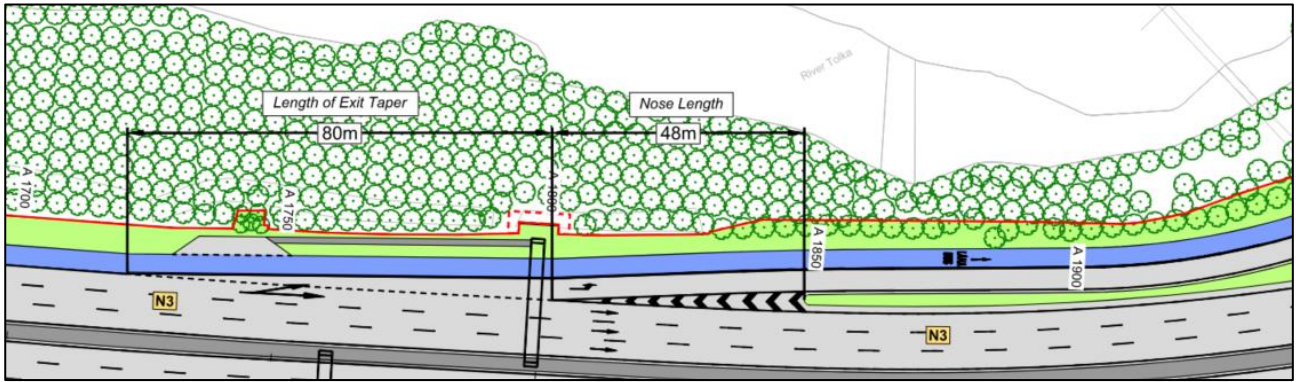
Proposed Diverge Layout on approach to James Connolly Hospital access road
